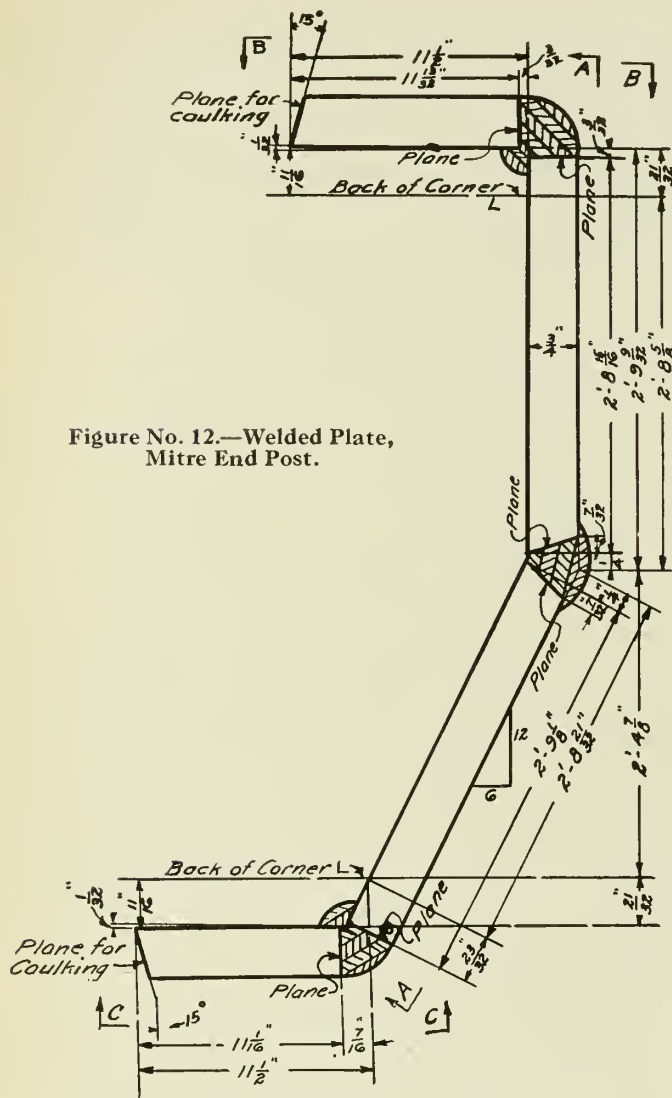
Welded Plate, Mitre End Post.
